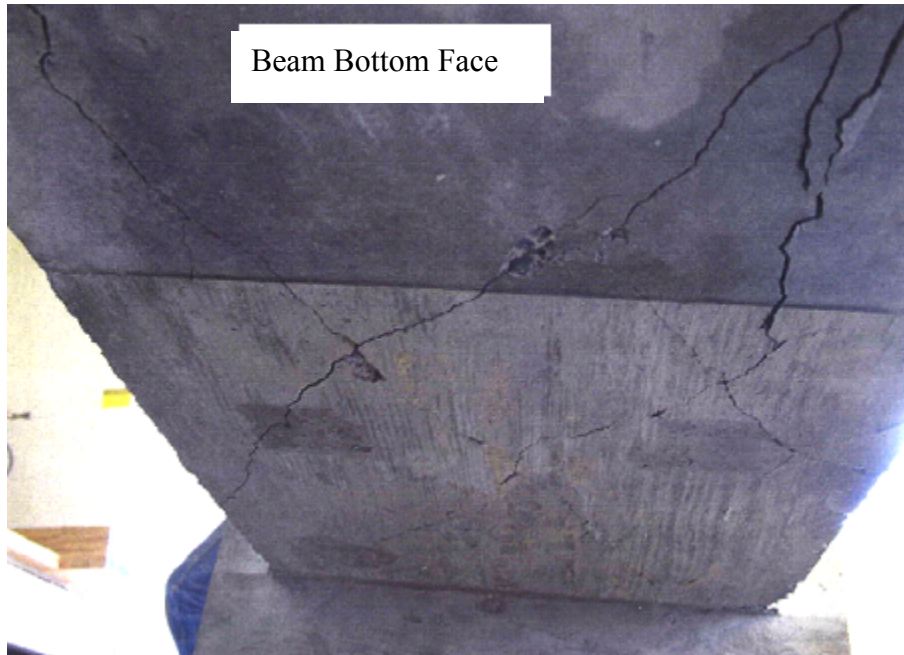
Torsional Cracks on the Bottom Face of Specimen ASO
